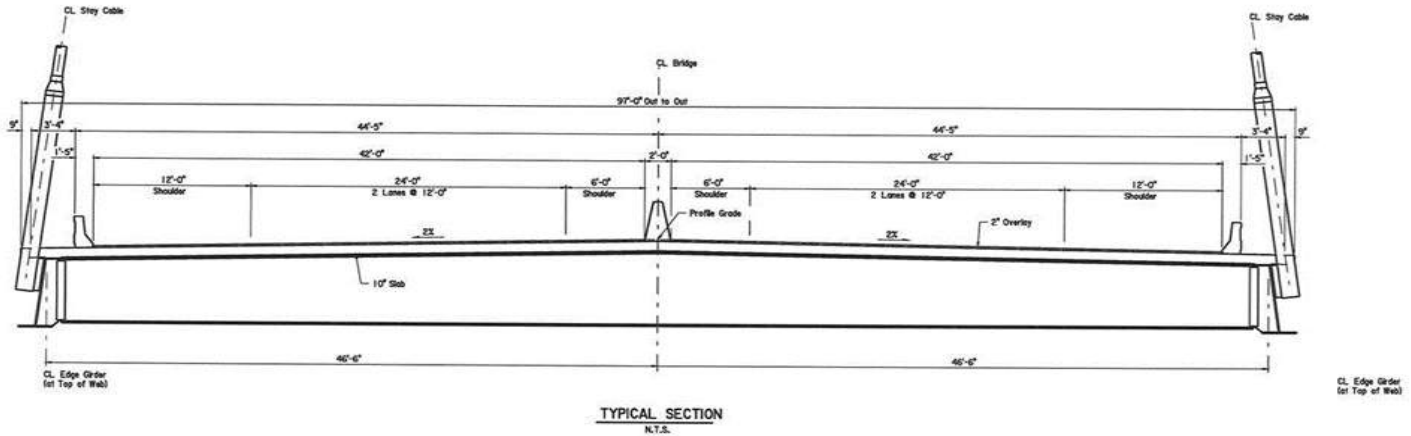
Proposed Typical Section of Iberville Mississippi River Bridge Roadway Deck (Source: Baton Rouge Loop Tier I EIS)
